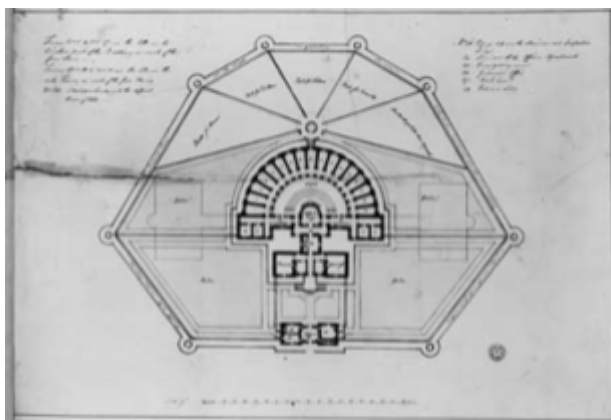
Robert Adam's Floor Plan for the Bridewell, date unknown.
